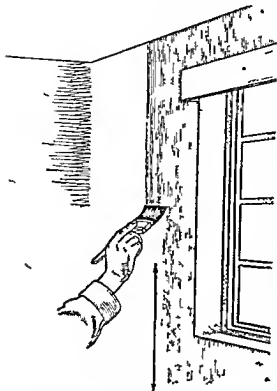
Laying off should be done vertically from the ceiling to the floor when painting walls
